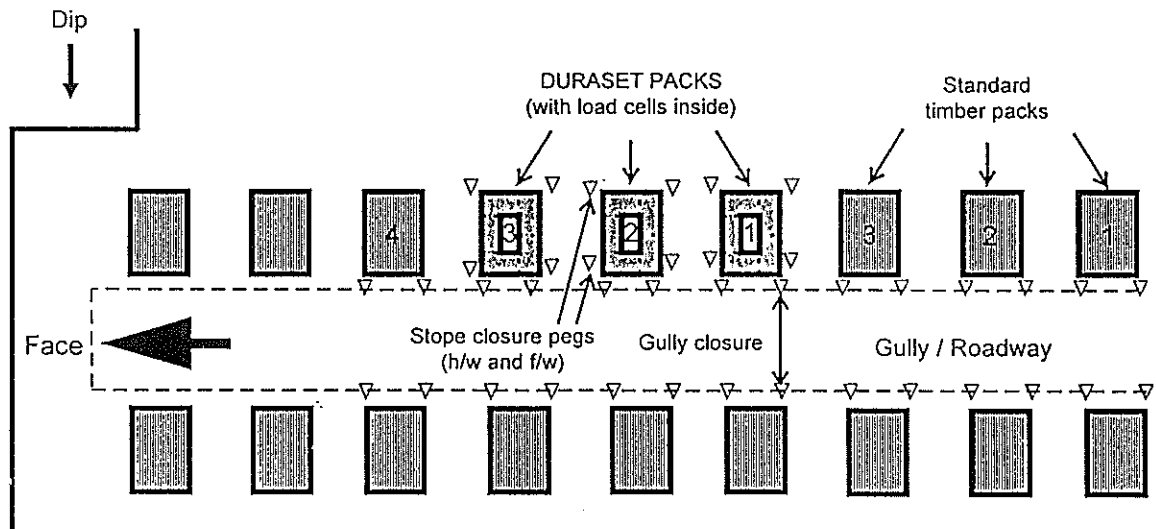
Schematic layout of instrumented trial foamed concrete packs
